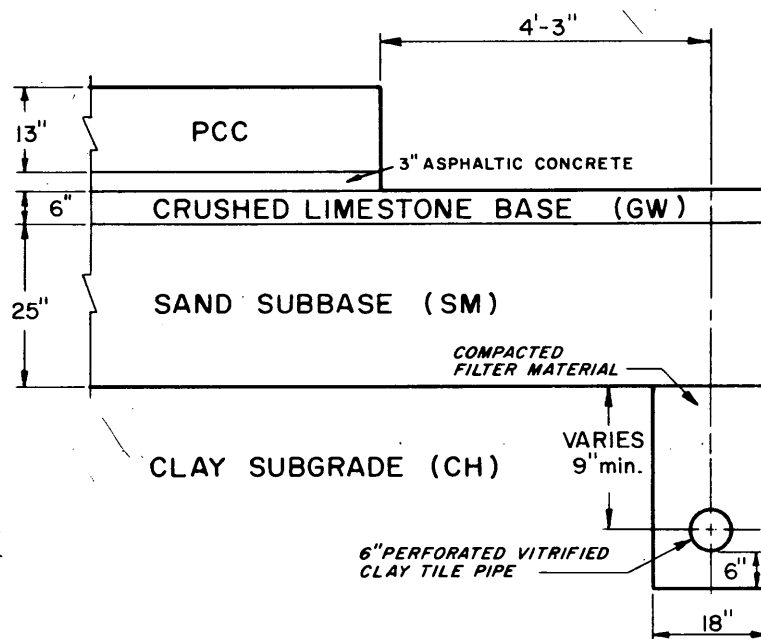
Typical pavement and subsurface drainage sections, N-S Runway, Selfridge AFB.
